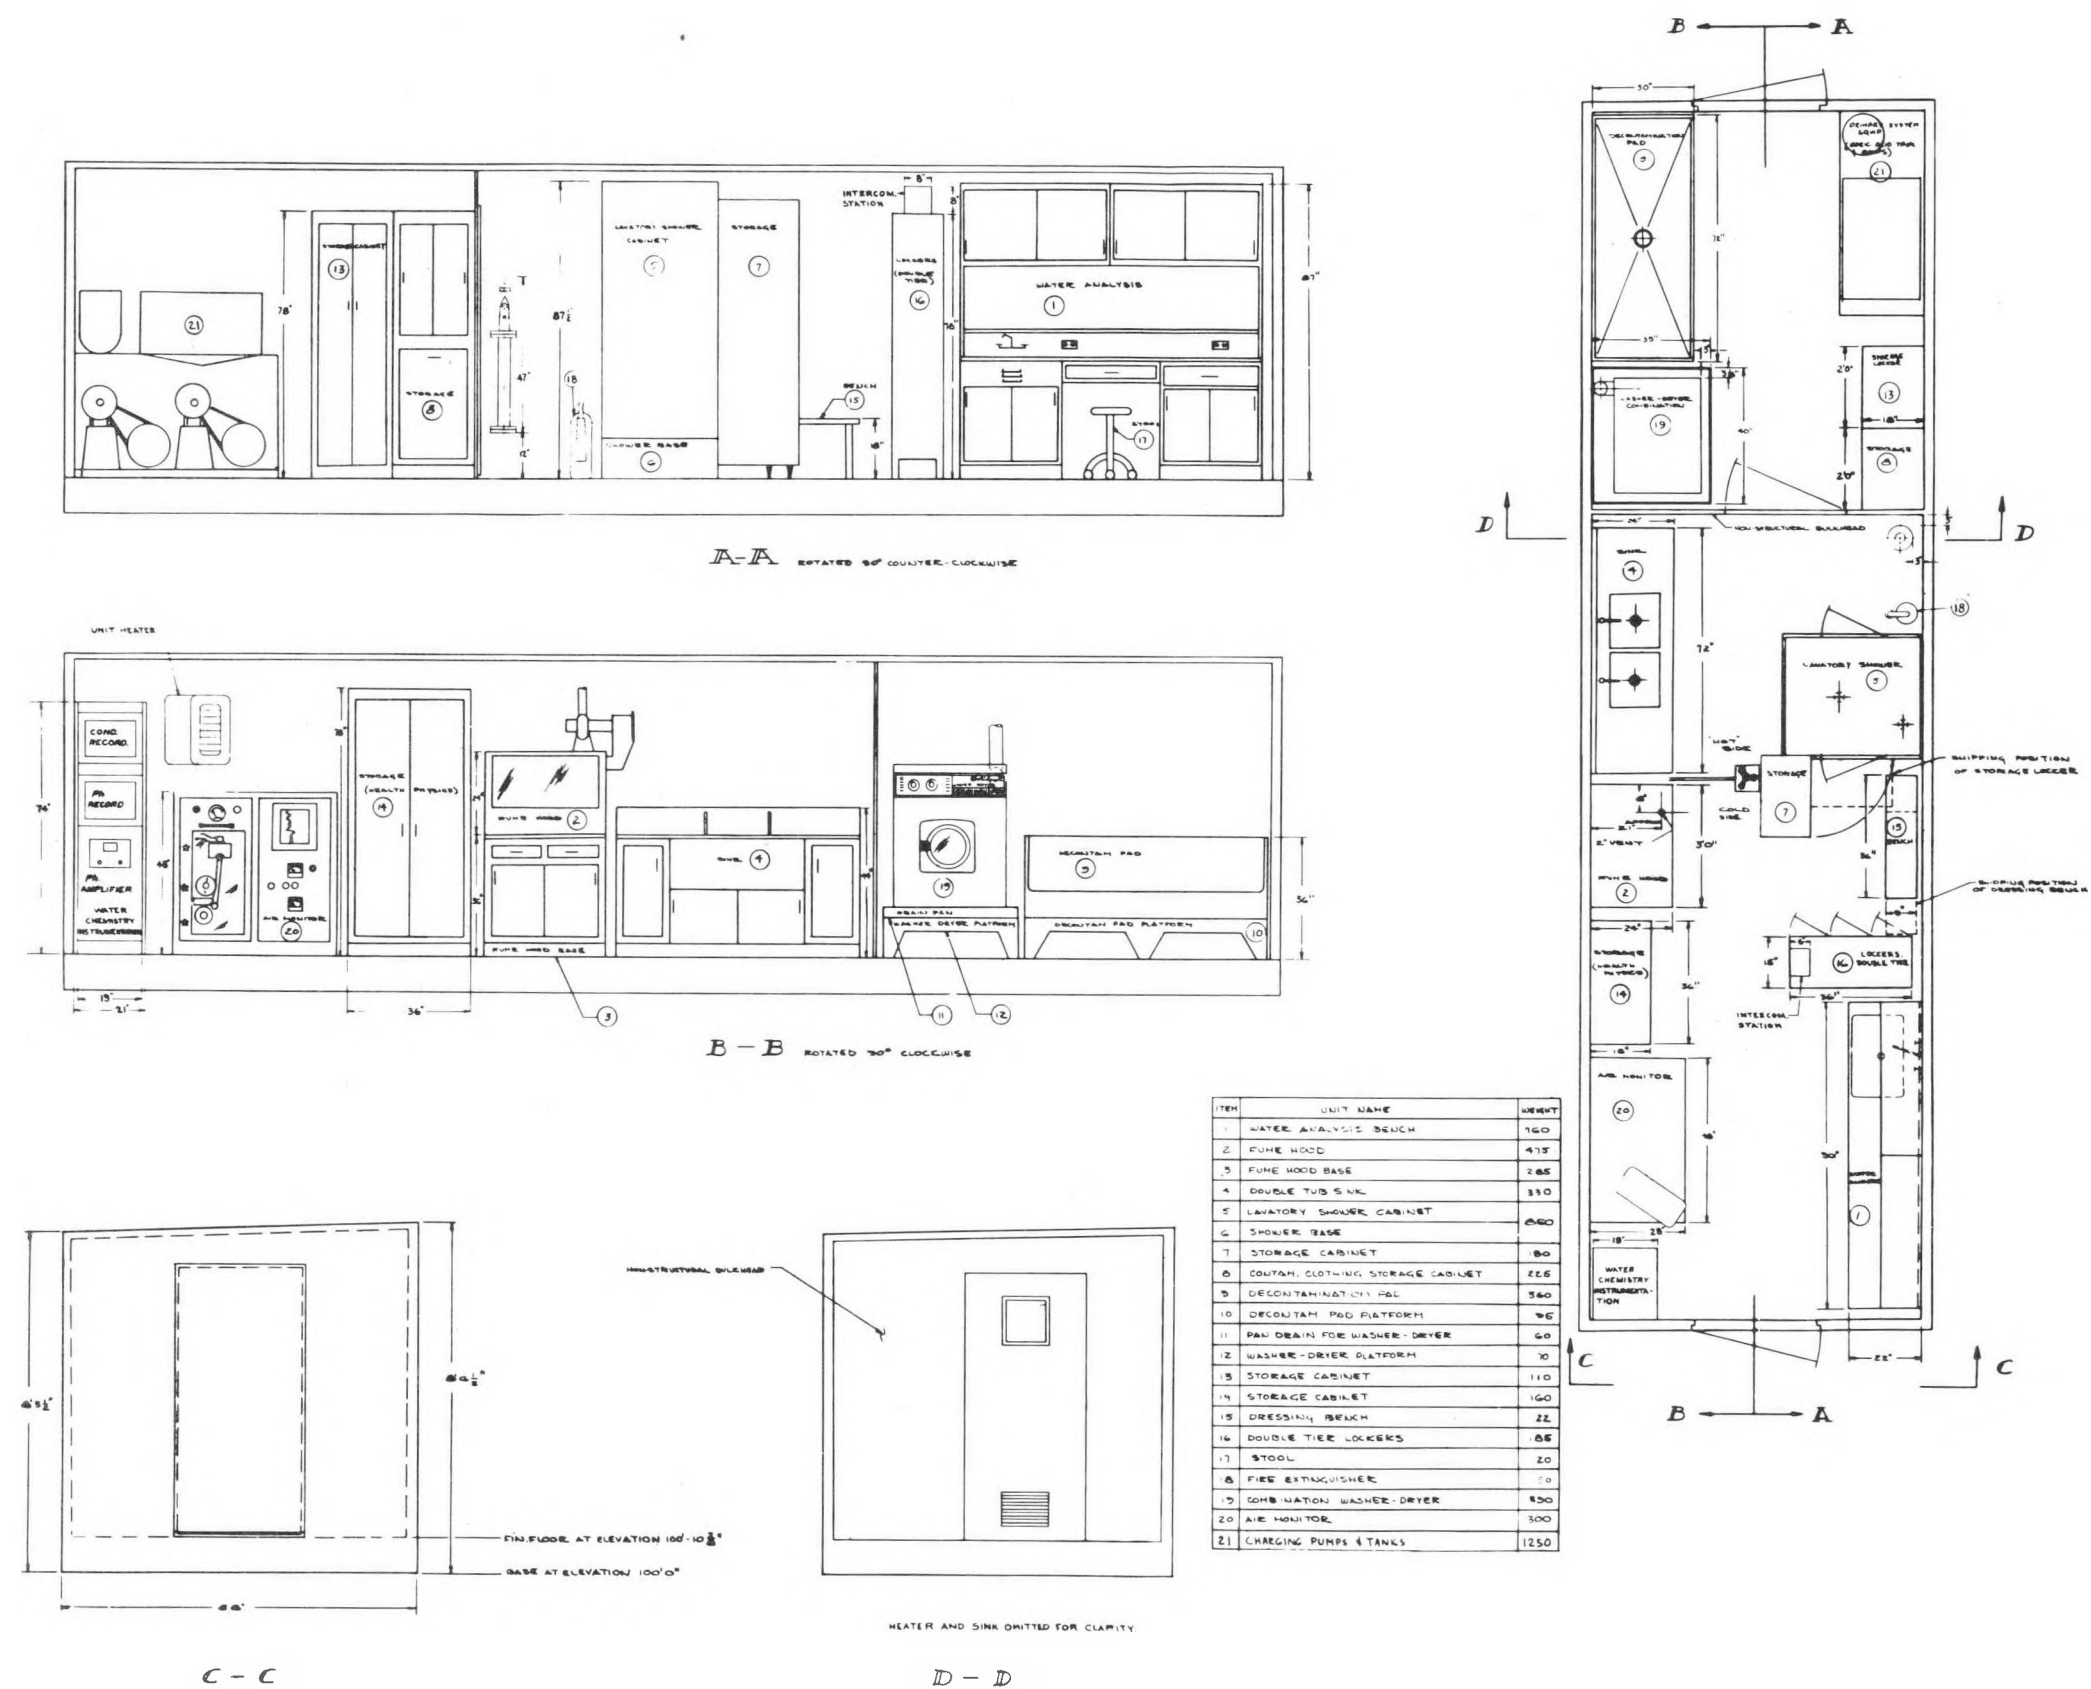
Equipment Layout--Operating Positions, Decontamination Package
